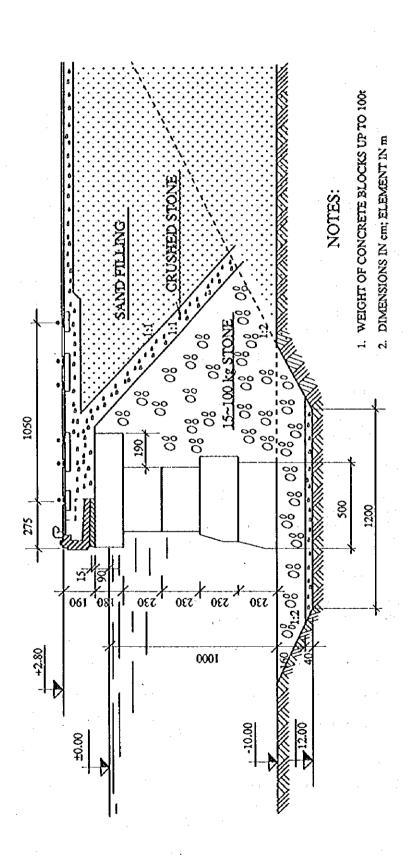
Standard Cross Section of Quay Block Type (-10.0m)
